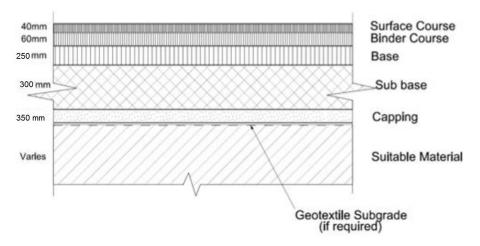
Pavement Structure of Bus Lane. Typical detail
